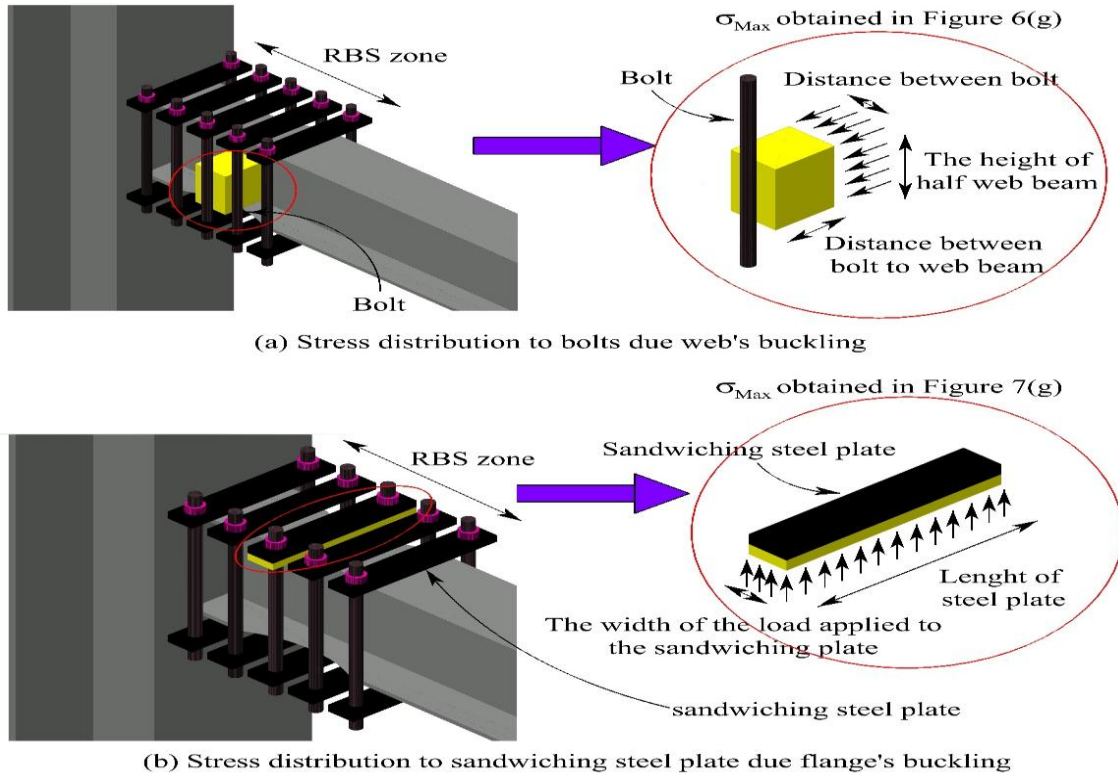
Pressure Distribution to the Bolts and Steel Plates in the Reduced Section Caused by Web and Flange Buckling
